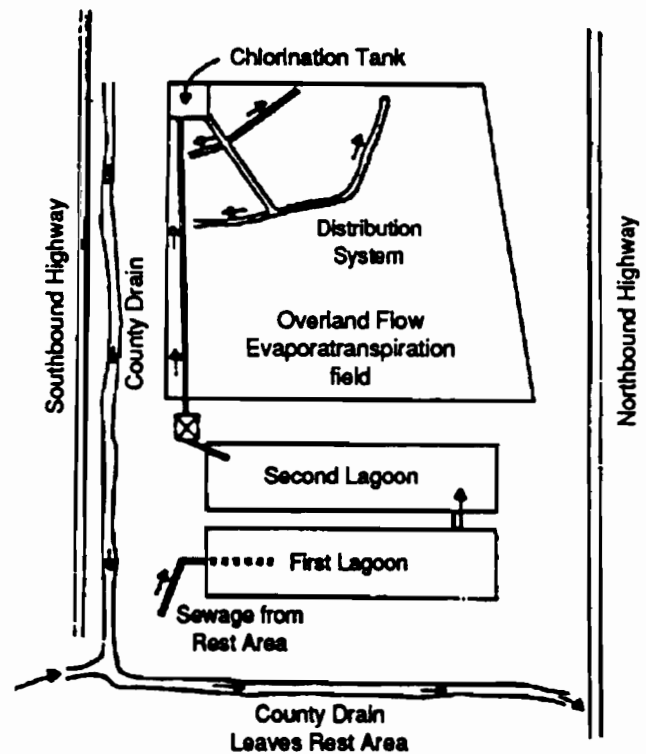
Plan view of lagoons and overland flow-evapotranspiration system, Clare Rest Area and Travel Information Center [20].
